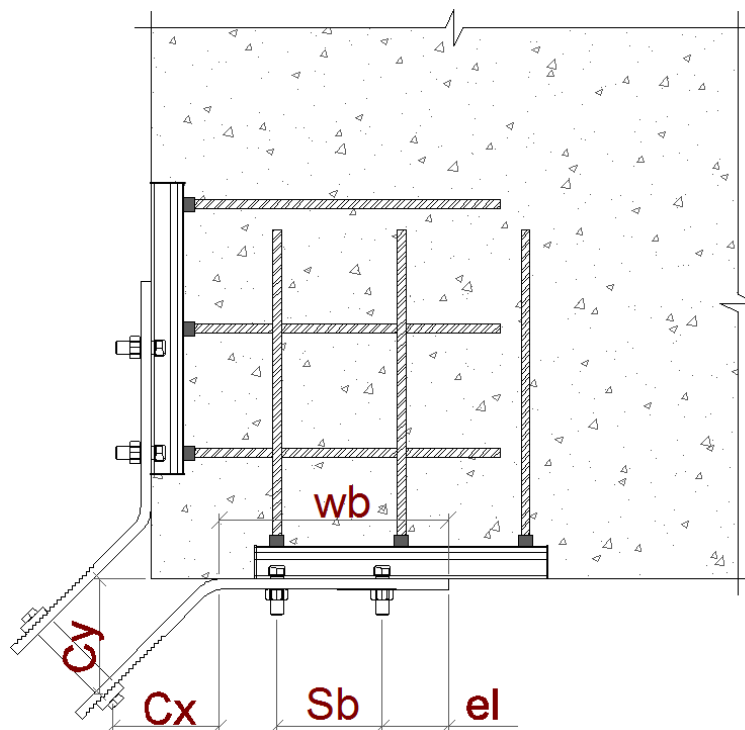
Plan View - Face of Slab at Exterior Corner
